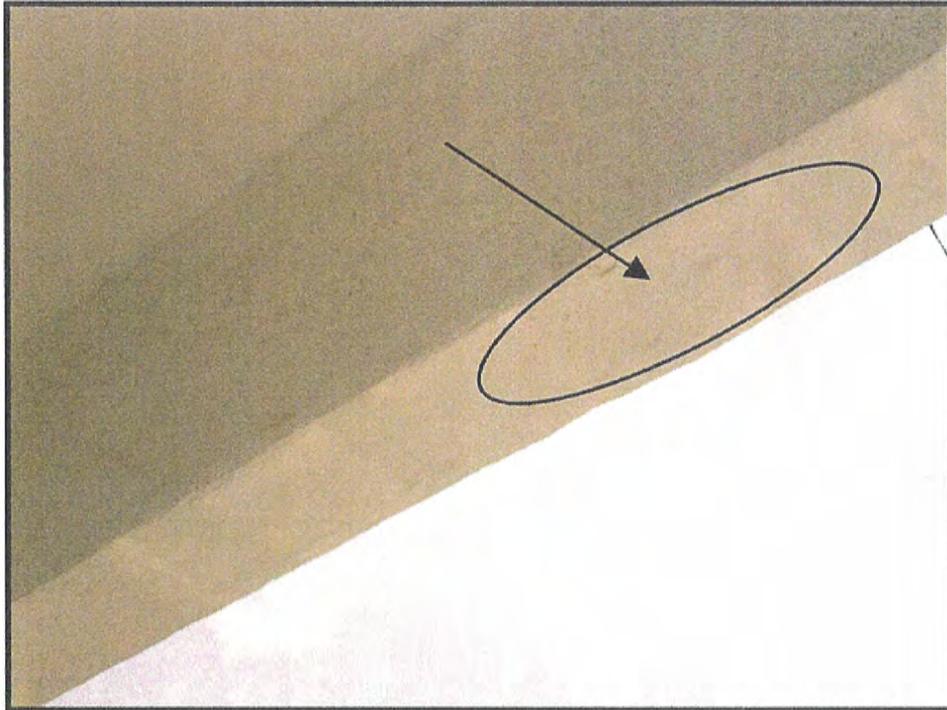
Delamination on bottom face of balcony edge beam along east side of building.
